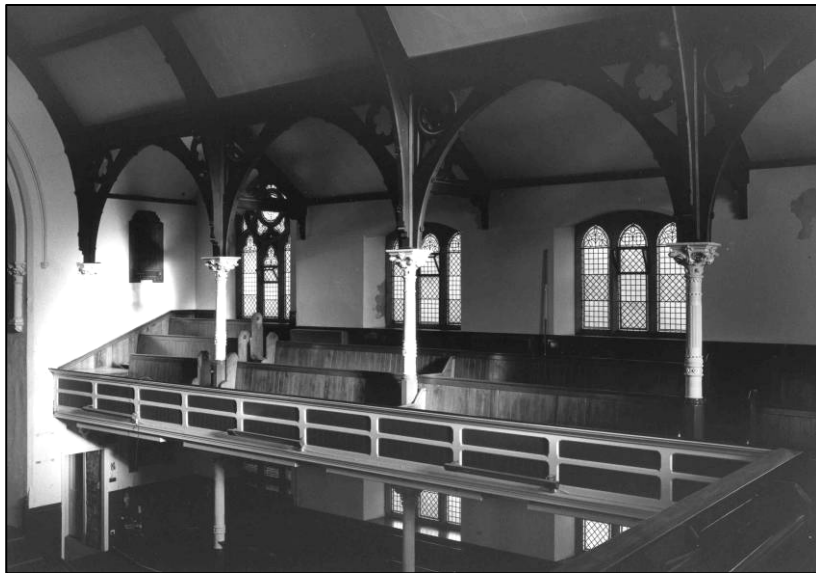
Church: 1F gallery, E side, looking NE (photo 3/16).
